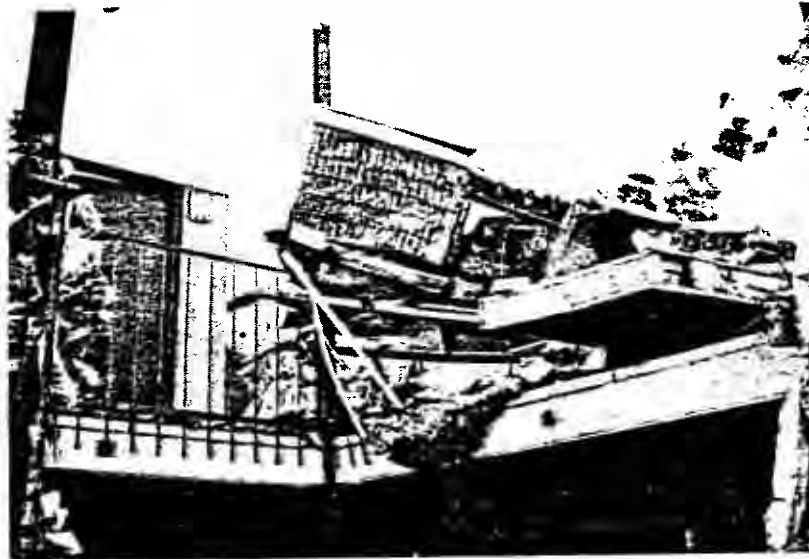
VIEW OF COMPRESSOR NO. 3 WHICH WRAPPED AROUND STEEL COLUMN
